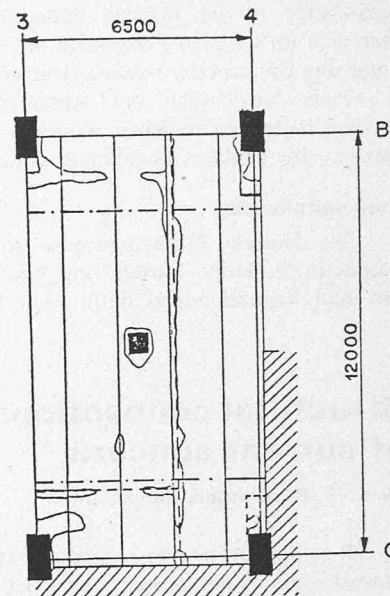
(right). Examples of non-adhesion areas on a precast floor slab in which the units and topping were to interact. There is no interaction at areas near the support ("k" ends) where the concrete topping was cast on in-situ structural concrete. Other non-adhesion areas are near construction joints in the topping concrete. The survey was made by the Swedish Cement and Concrete Institute, sponsored by the Association of the Swedish Prefabricated Concrete Industries and financed by the Swedish Council for Building Research
